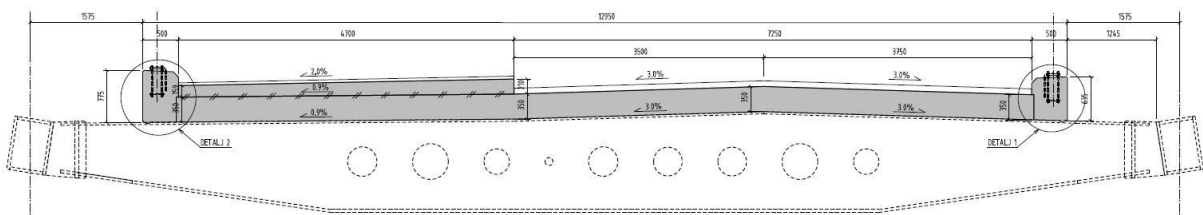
Transverse beam and concrete deck. Driva Bridge [18]
